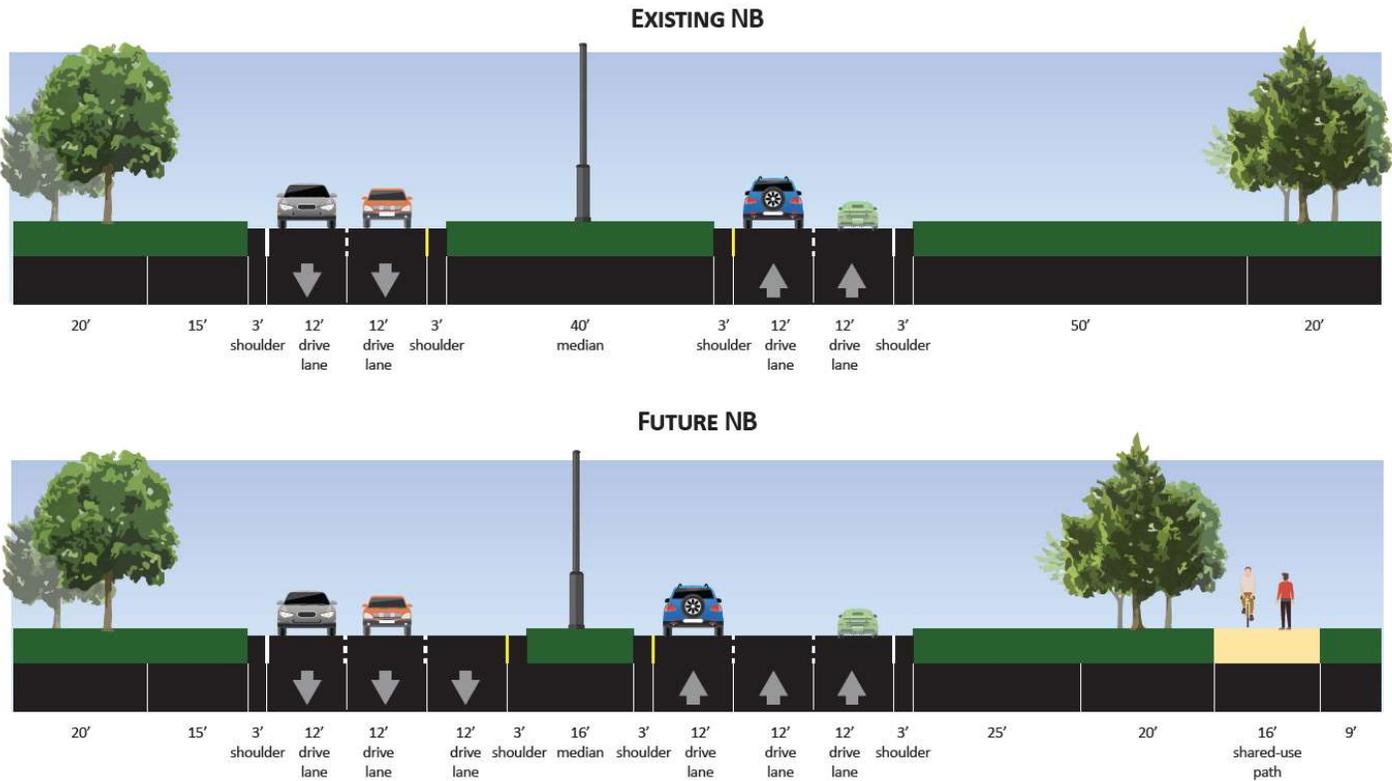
Example Typical Section of Godwin Drive South of Wellington Road before and after Widening
